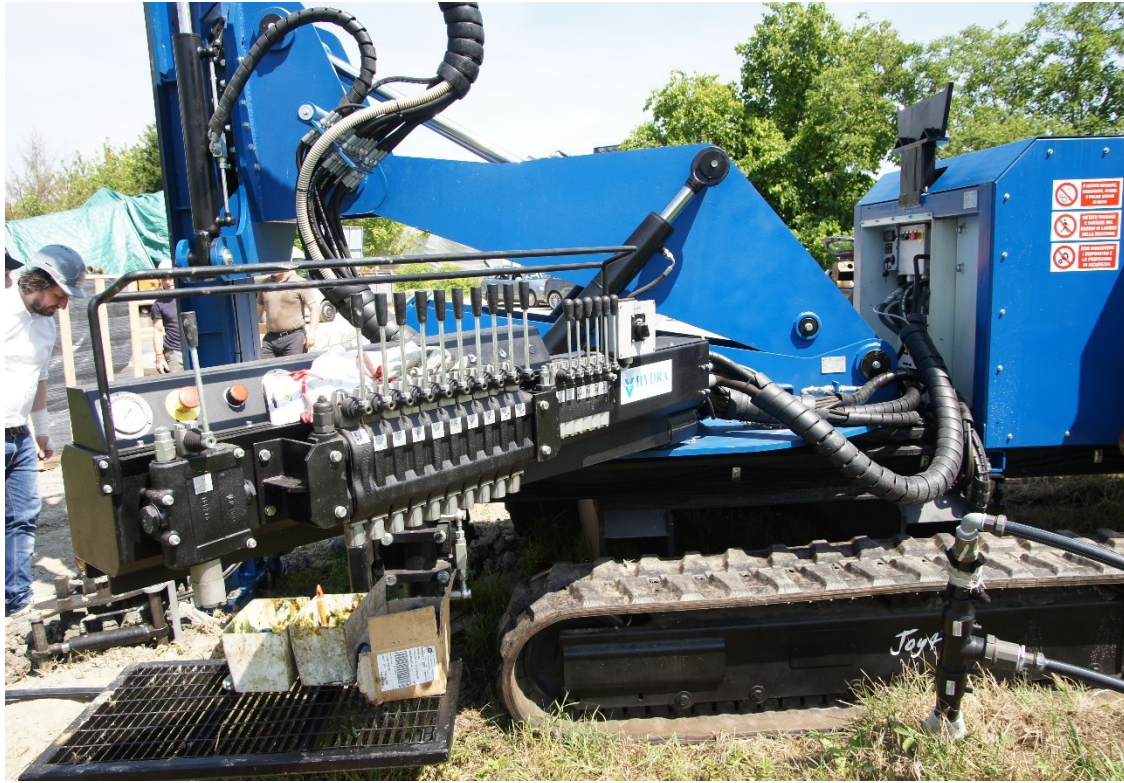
Drilling machine *JOY 4* from HYDRA s.r.l. during the test drillings in Molinella (Italy)
